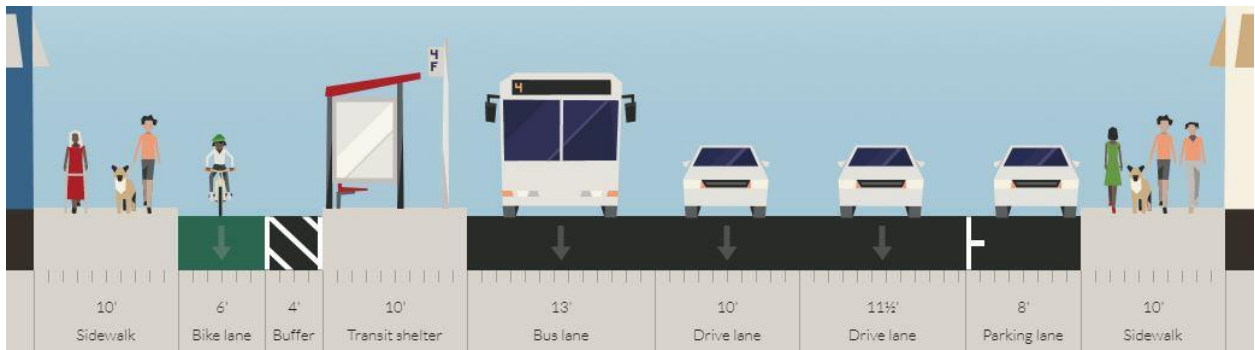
Section View between 11th Street and Falmouth with bus stop looking west
